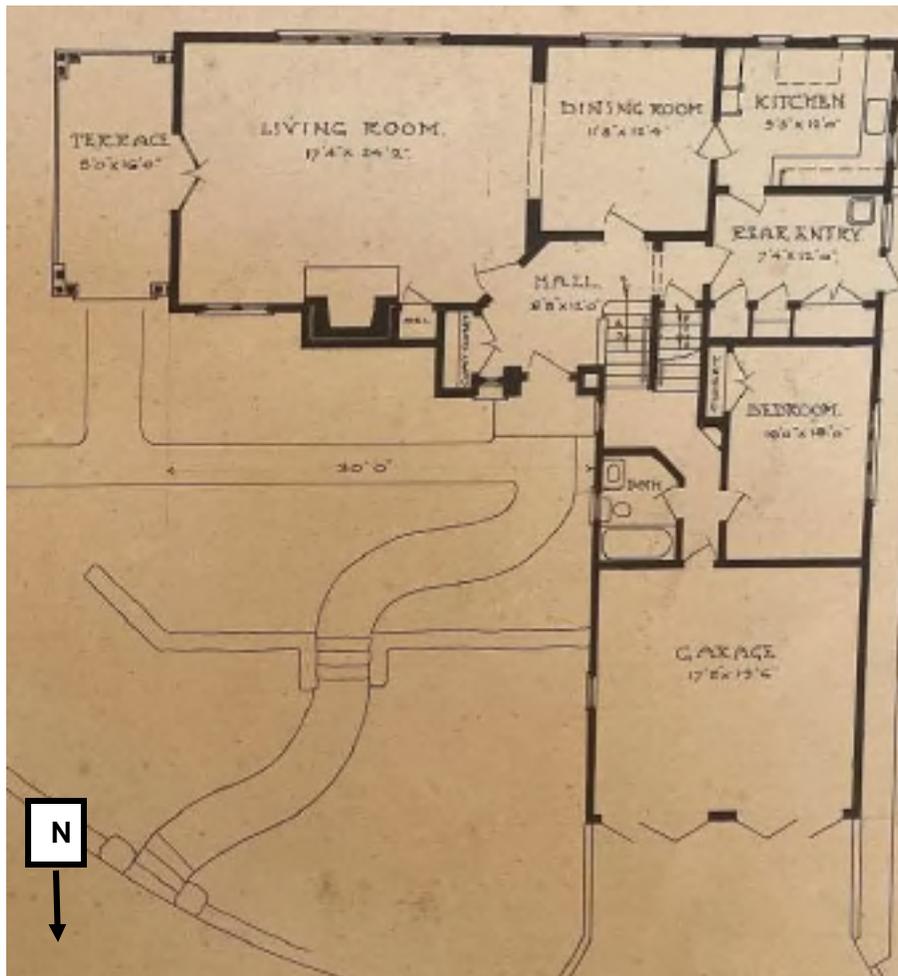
, First floor plan set depicting the garage, + prepared by Leonard Cooke
